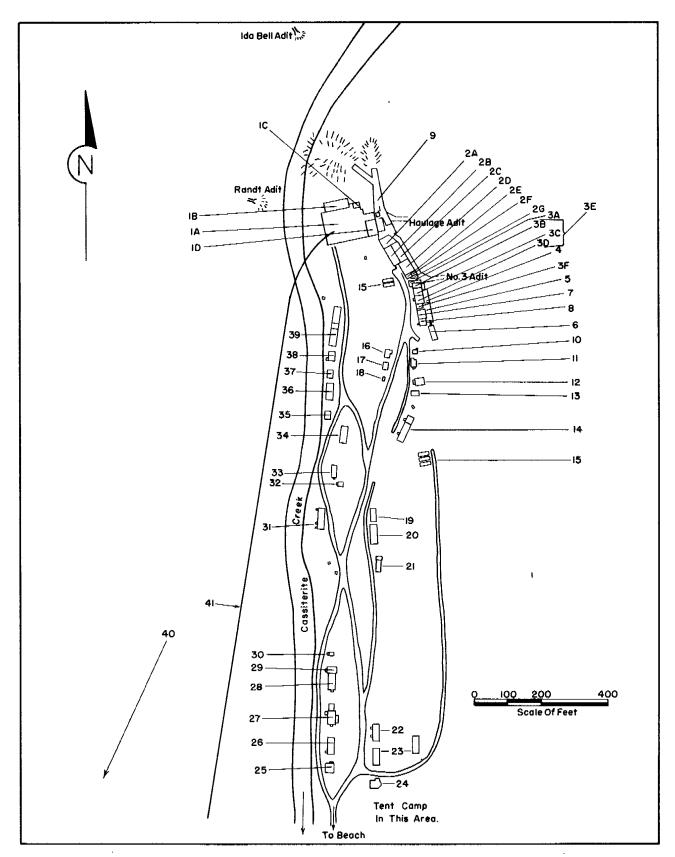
Plan of Surface Plant, Lost River Mine.
